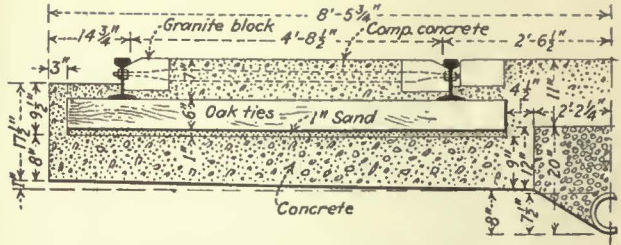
Granite nose block and compressed concrete pavement with rails on wooden ties
